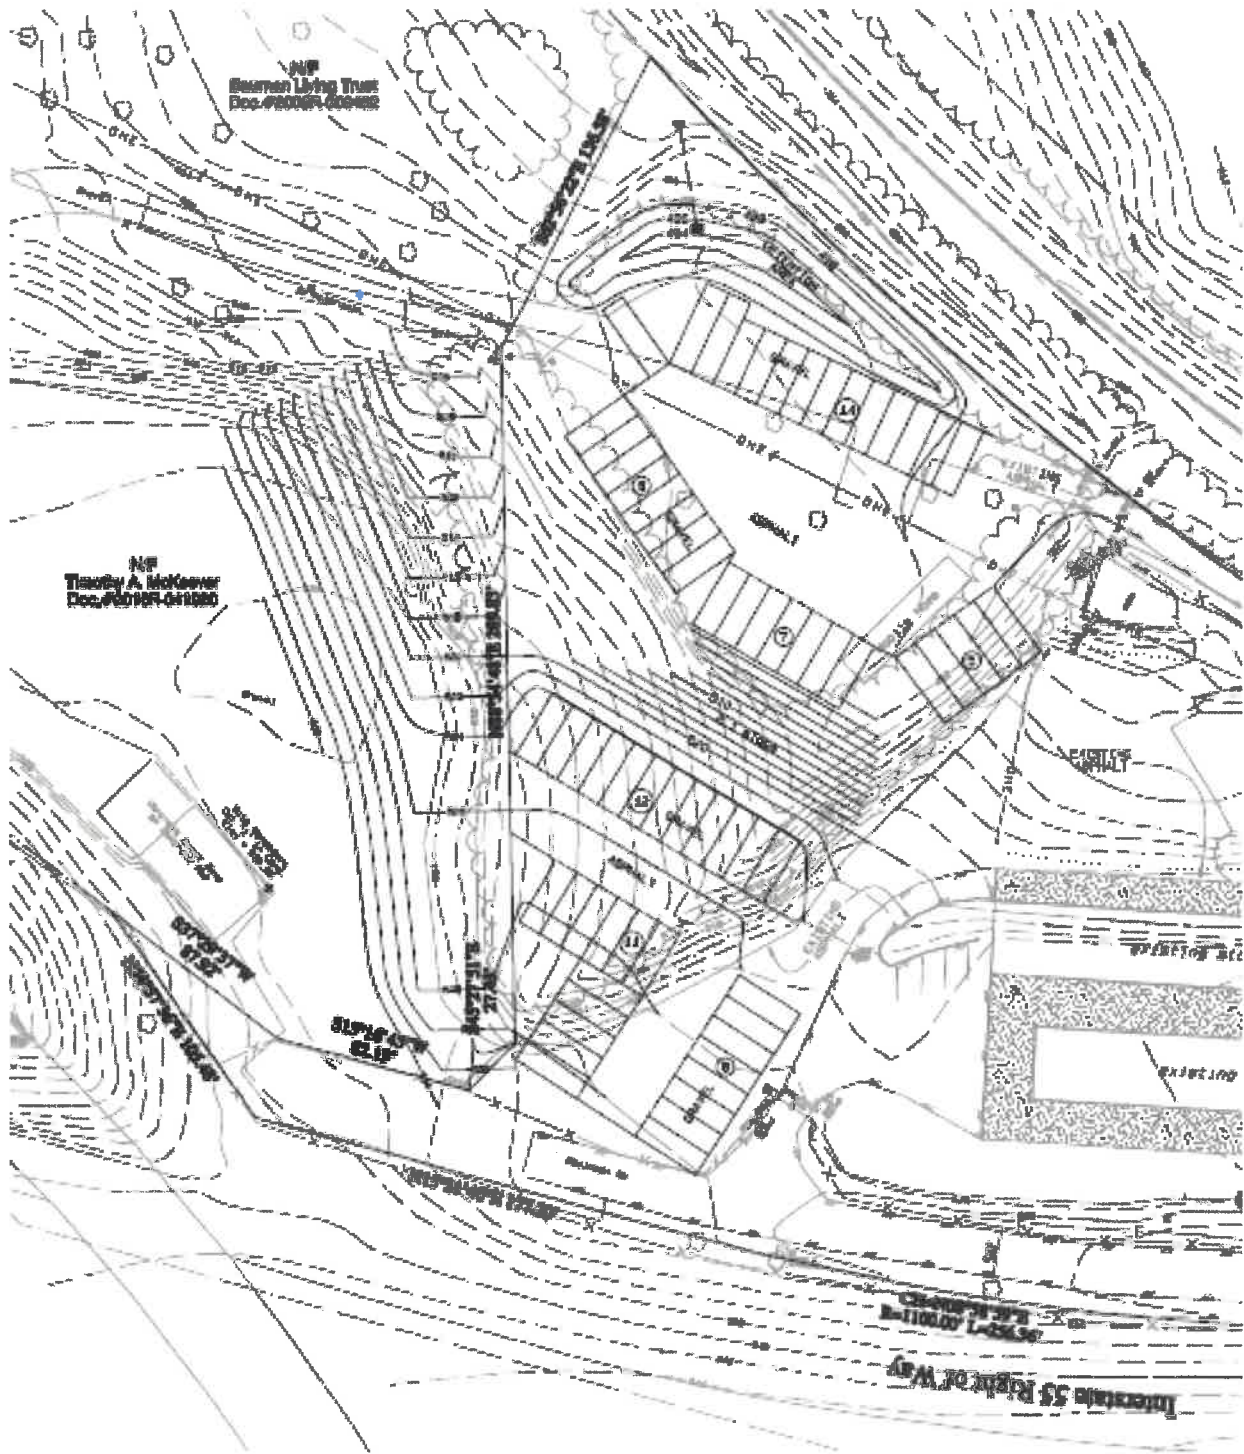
PRELIMINARY SITE PLAN CONTINUED
